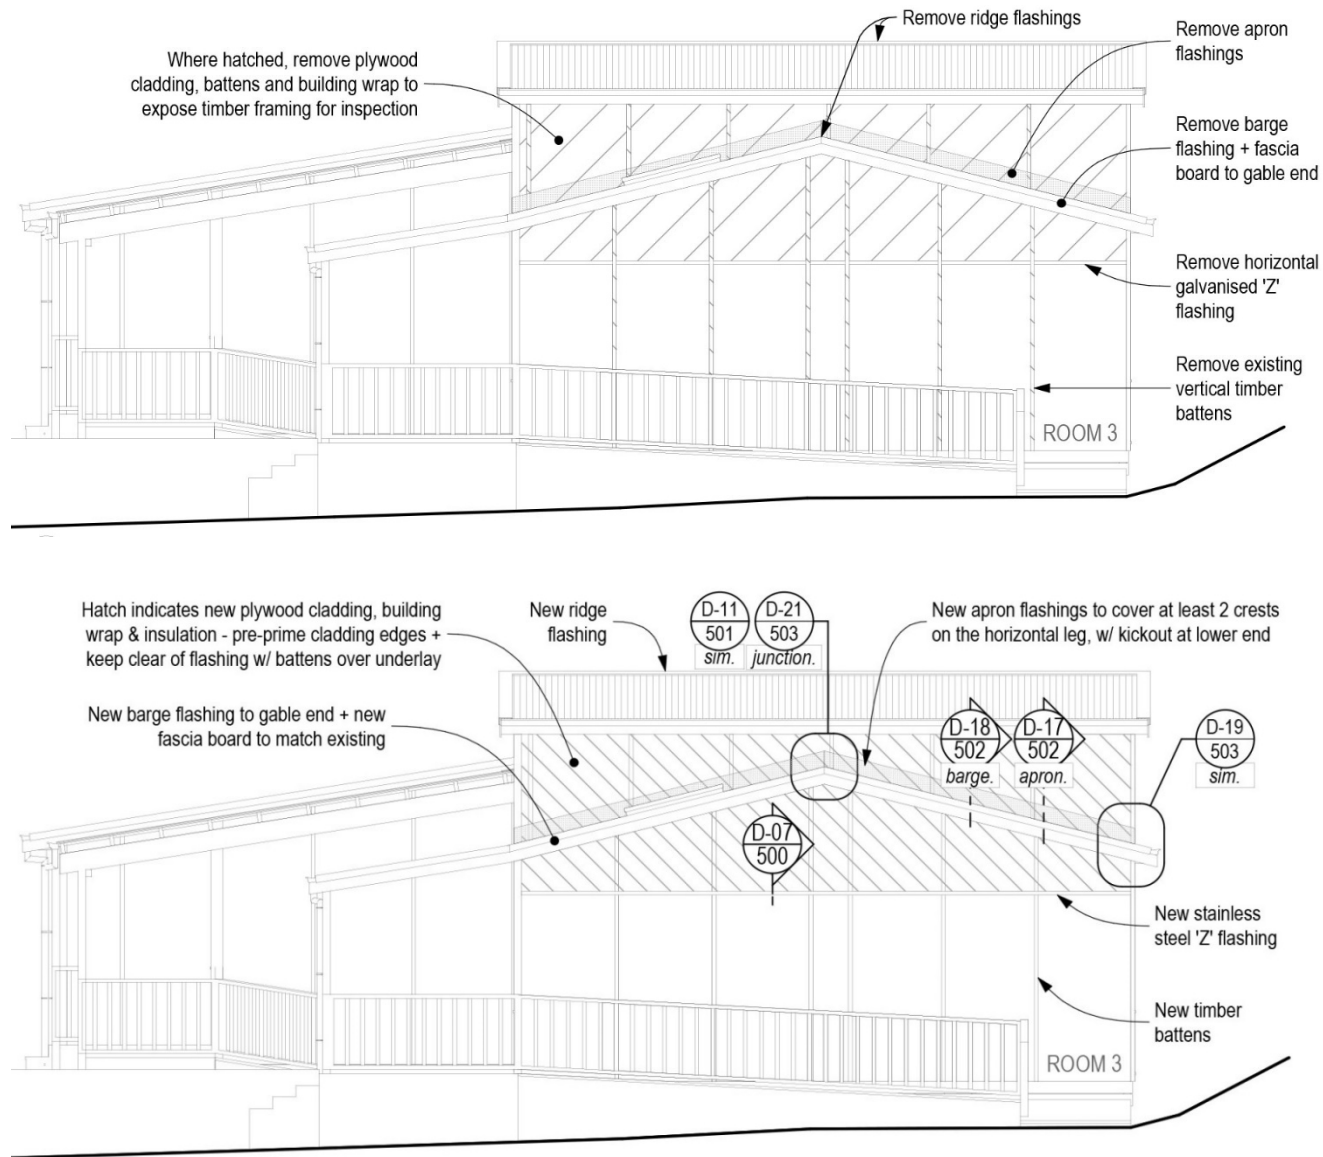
South Elevation existing and proposed works – 200 series Architectural drawings
